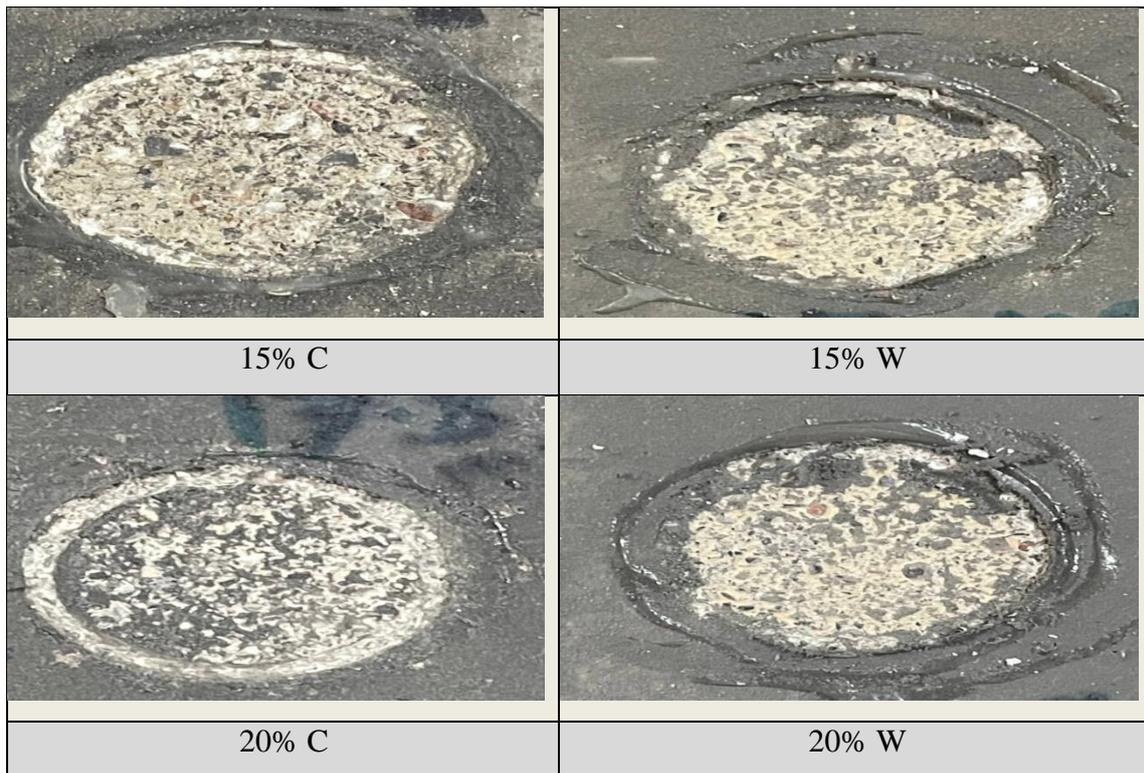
Image of adhesive failure shown on the concrete substrate.
